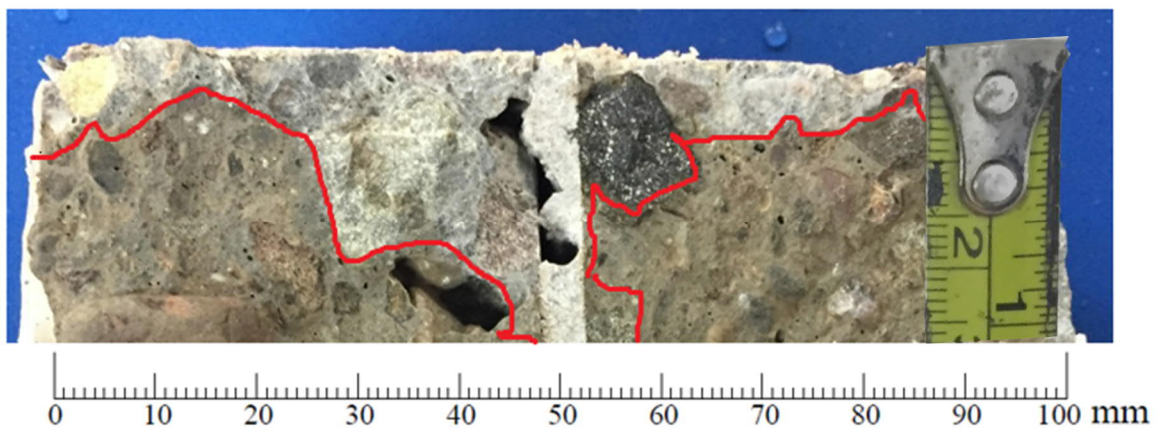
Poor jointing technique and high chloride ingress around the epoxy layer
